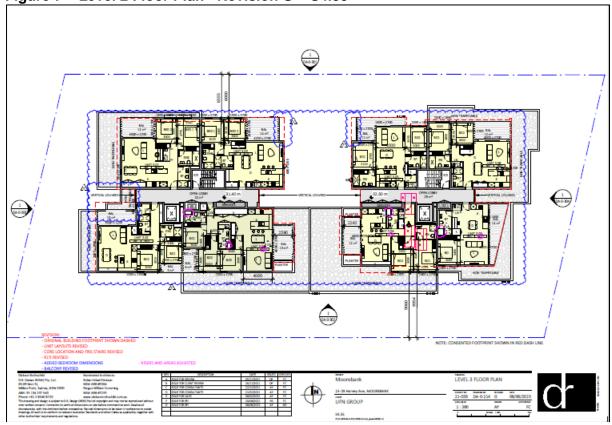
Level 3 Floor Plan - Revision G – S4.55
